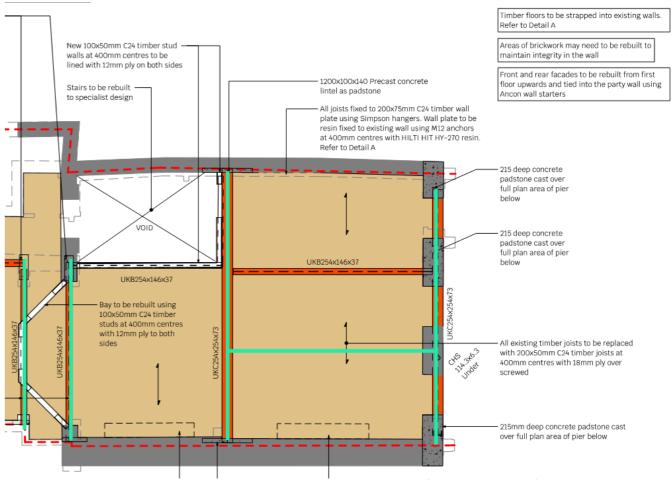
Proposed First Floor Plan - existing timber bressummers shown in green (layouts similar above)
